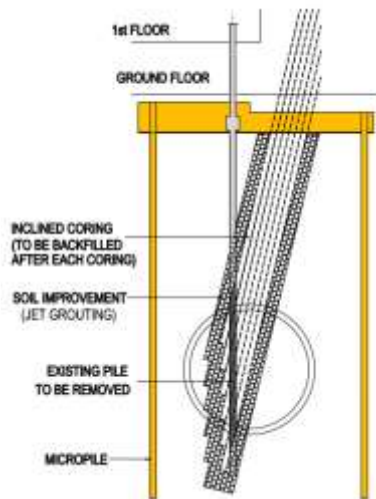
Typical section of pile removal from ground surface using coring rig.
